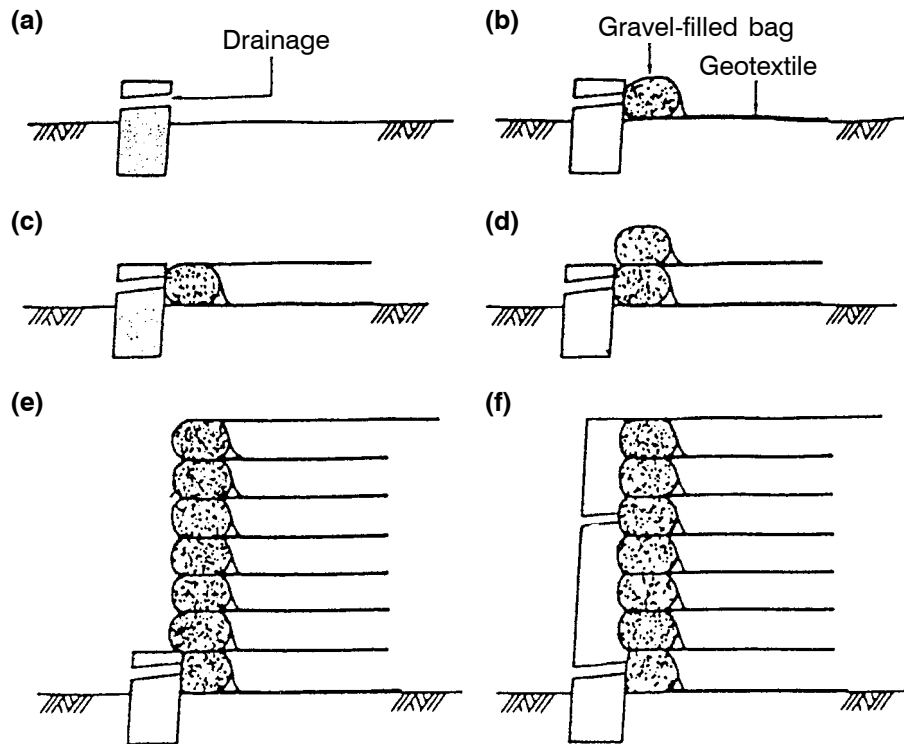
Standard staged construction procedure for a GRS-RW: (a) concrete base; (b) geotextile and gravel-filled bag placement; (c) backfill and compaction; (d) placement of the second layer of geotextile and a gravel-filled bag; (e) all layers constructed; (f) concrete facing constructed.
